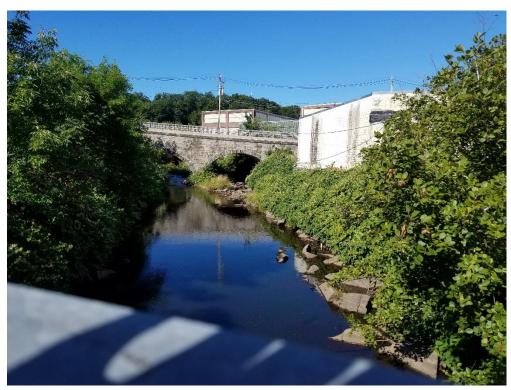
Vegetation and unprotected slope downstream of River Street and upstream of Sheldon Street.
